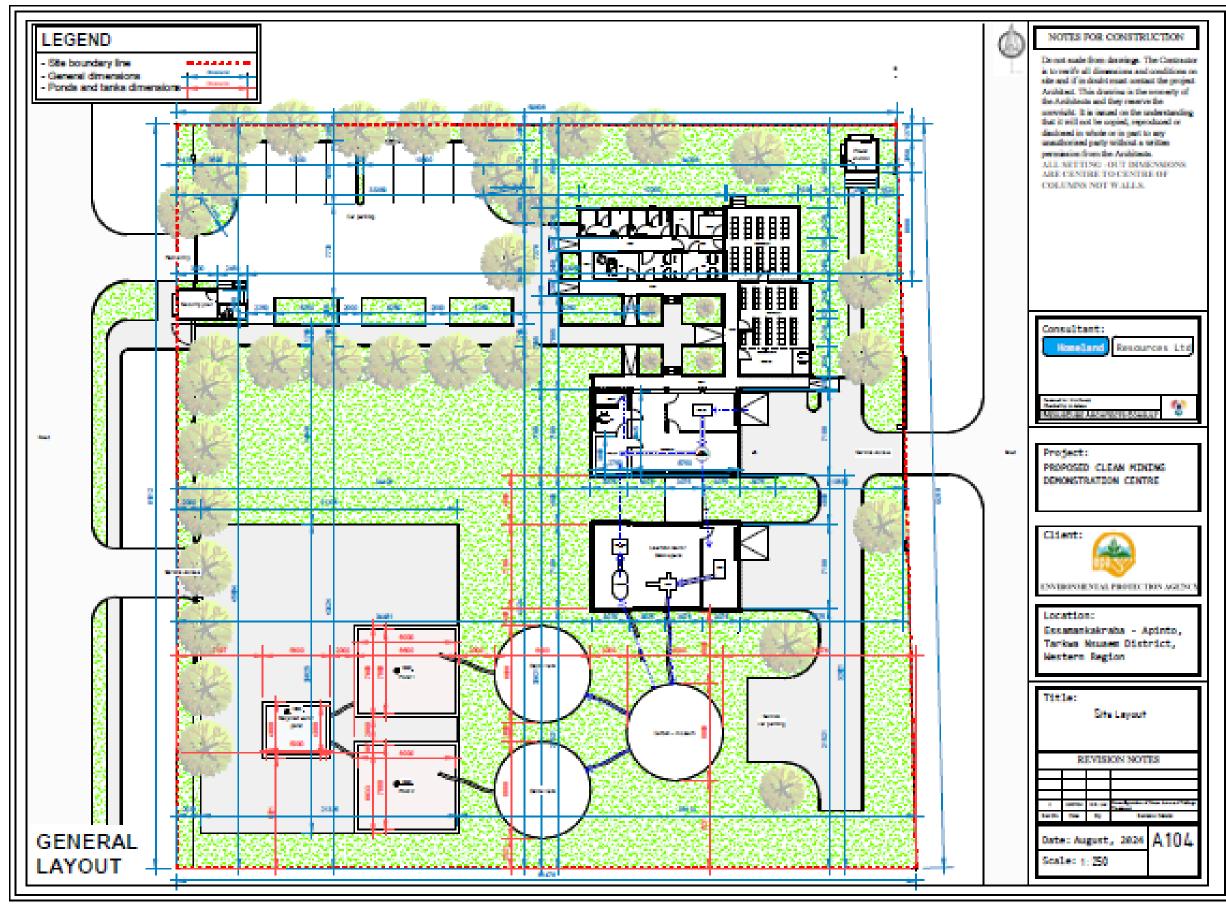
General Floor Plan of the Apinto Mine CDMC
